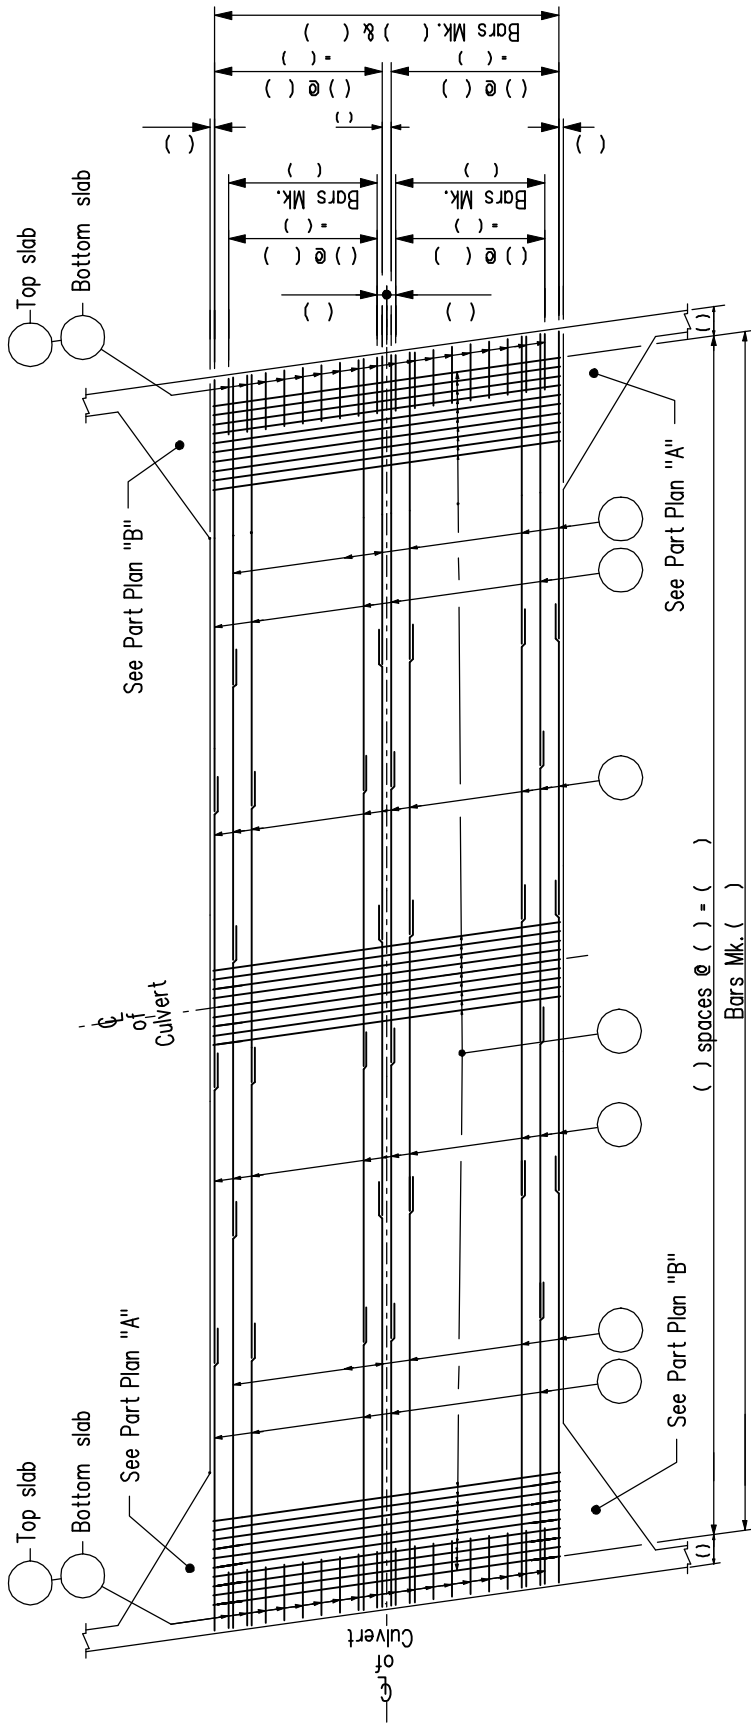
DETAIL DESCRIPTION		SLAB REINFORCING DETAILS TYPICAL DETAILS
